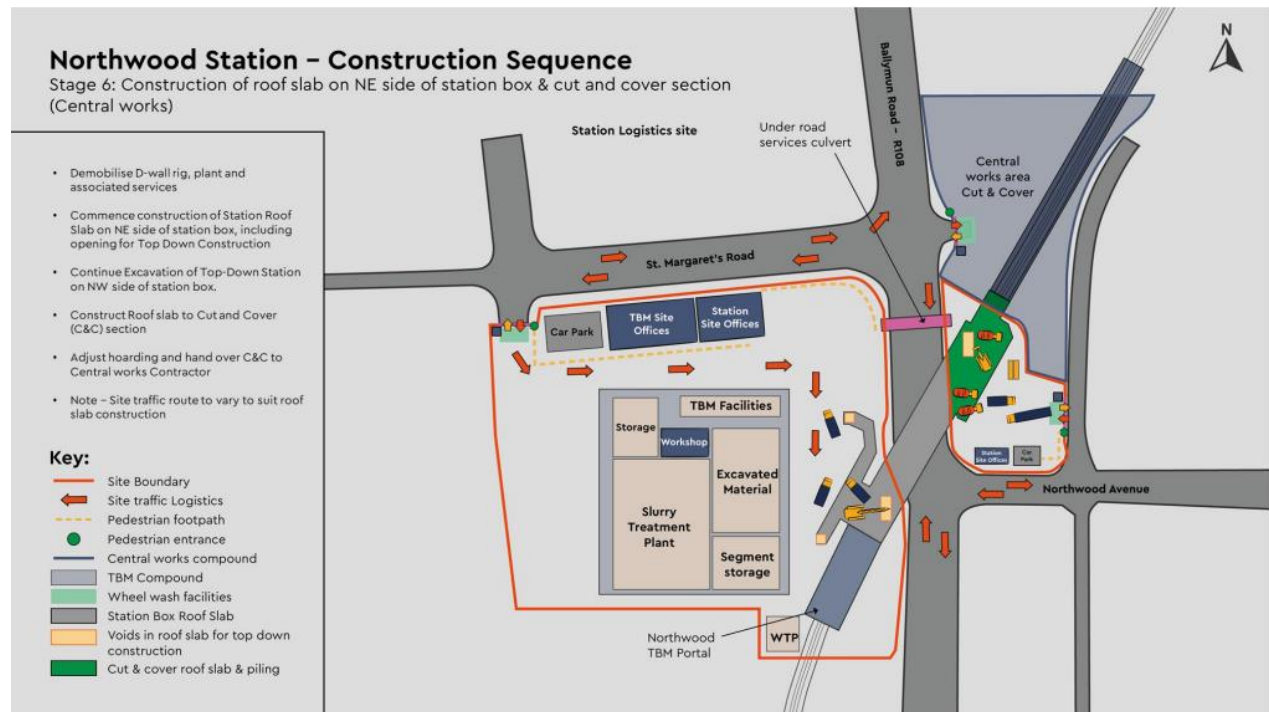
Northwood Station and Portal Stage 6 - Construction of Roof Slab
